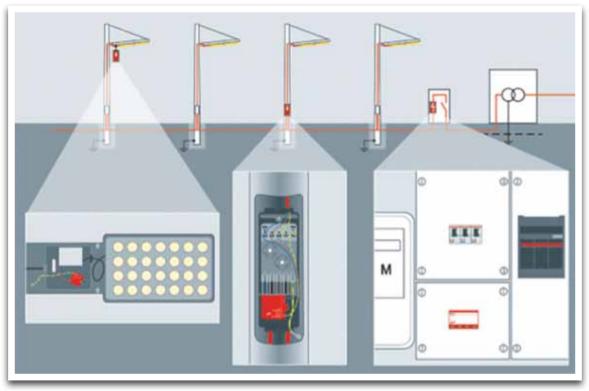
Possible places of installation of surge protective devices in street lighting systems
